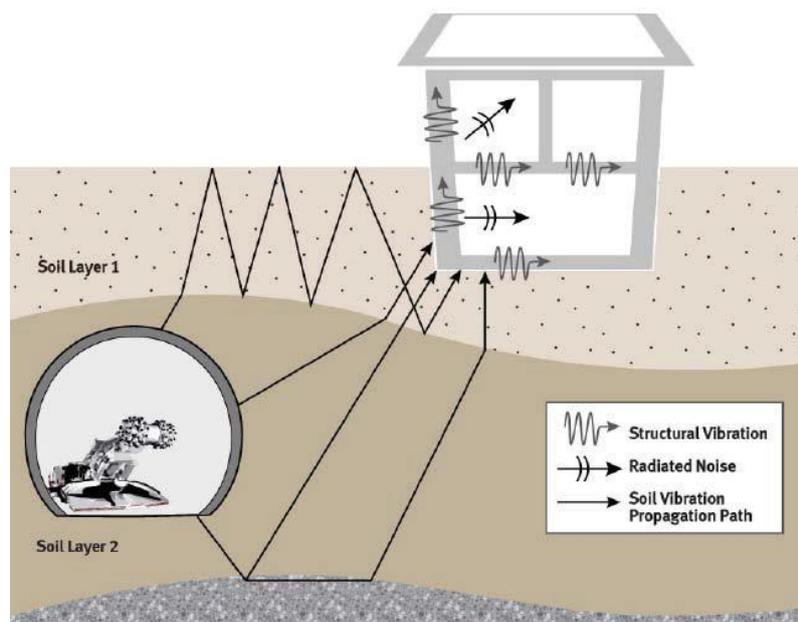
Ground-borne noise generation in buildings on surface during tunnelling excavation (source: Cross River Rail, EIS Chapter 16)
